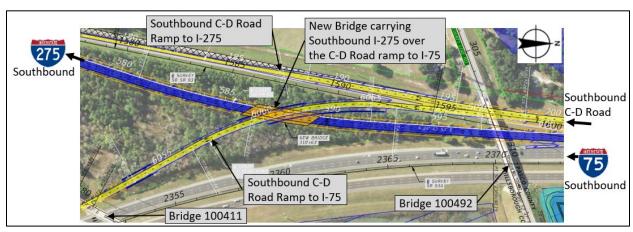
Alternative 2B–C-D Road Diverge & New I-275 Bridge over C-D Road Ramp
